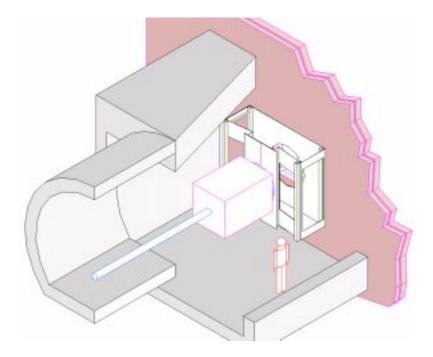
Existing cavern with RICH 1 assembly on beamline.
